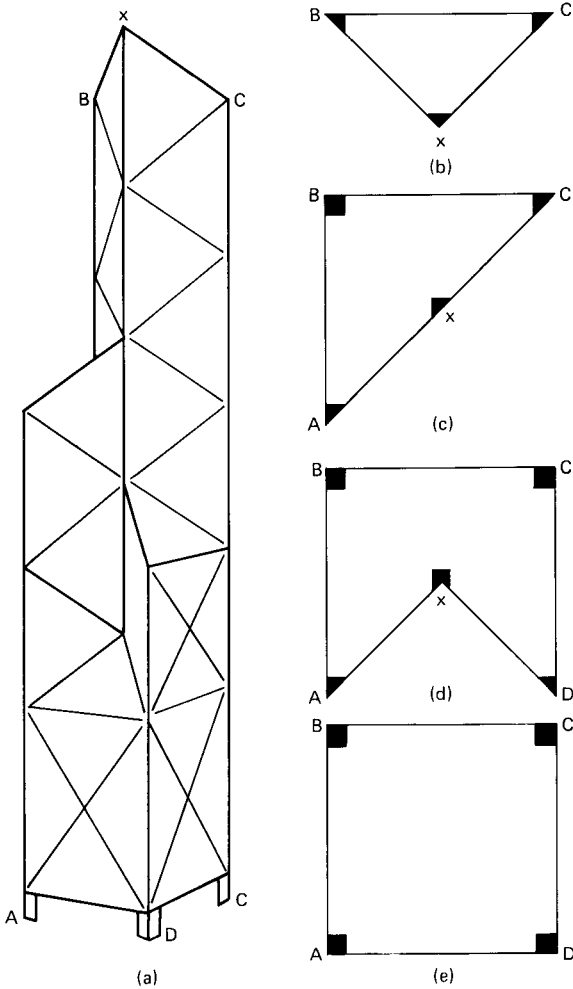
Schematic framing of Bank of China Tower (Structural engineers, Robertson & Associates, P.C.). (a) Elevation; (b–e) floor plans at various heights.
